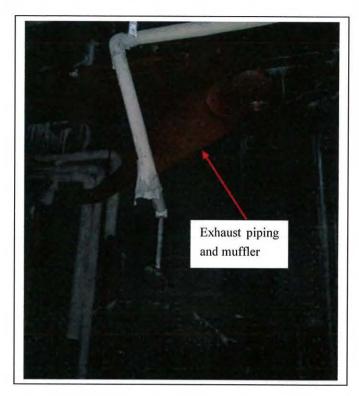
Presumed muffler and exhaust piping for the former generator. The white piping insulation is suspected of containing asbestos.
